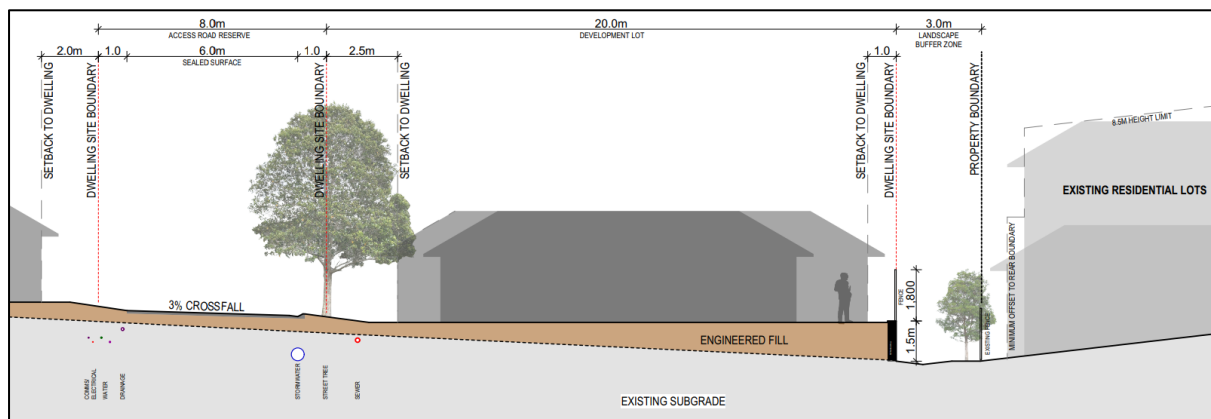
Section F – Proposed height compared to neighbouring properties (Source: King + Campbell, 2025)
